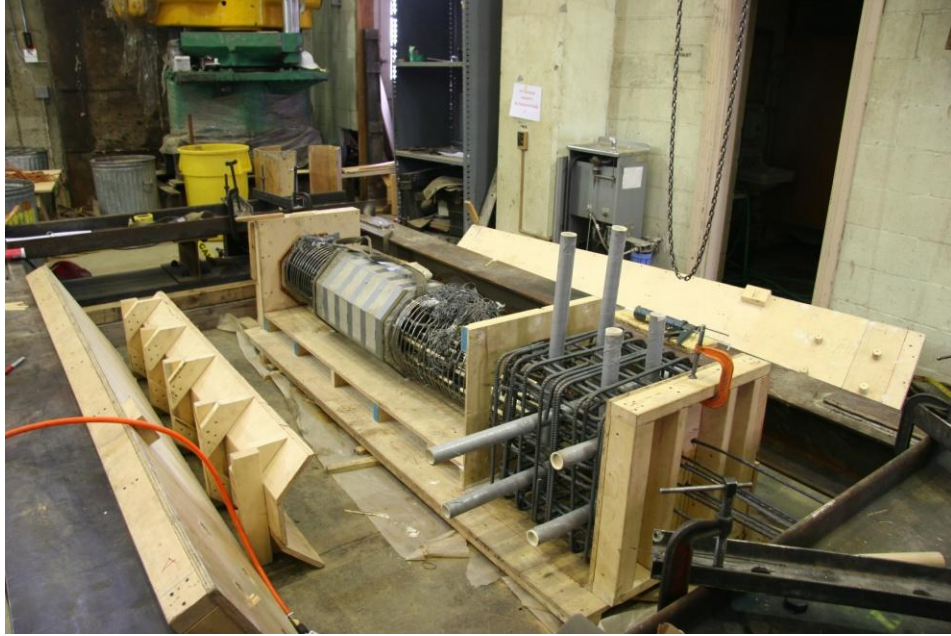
Specimen PreT-SF-FIB-SHK column installed in prestressing rig
